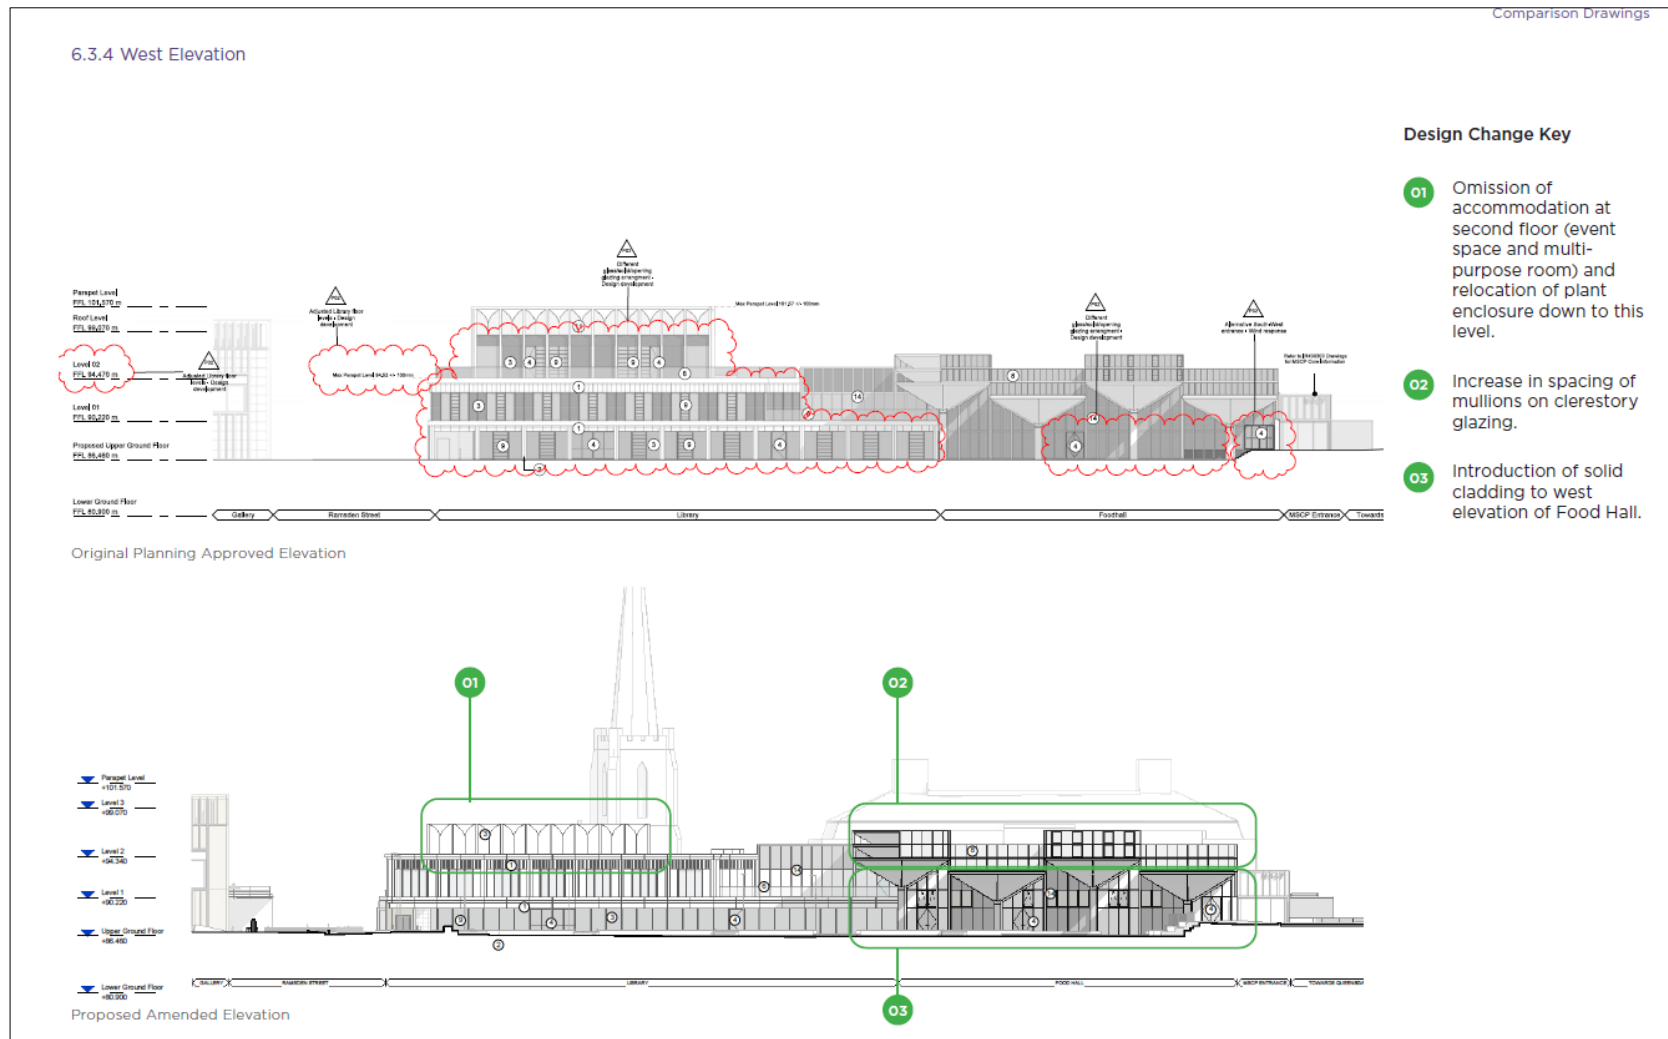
Comparison of the west elevation showing the scheme with the second floor removed from the consented scheme, as presented in the Design and Access Statement.
